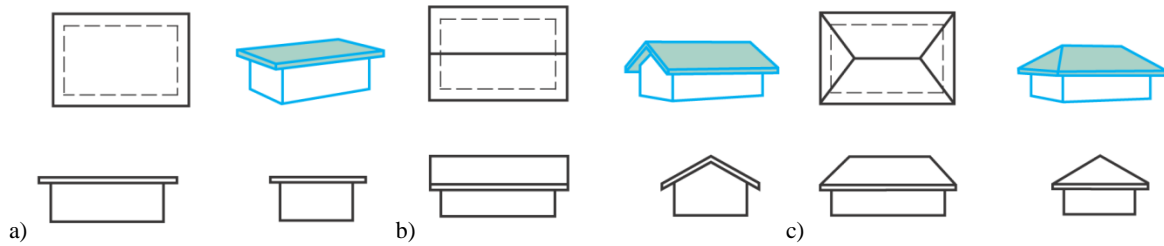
Simple roof structures: a) flat roof; b) gable roof; and c) hipped roof (Goodheart-Willcox, 2009).
